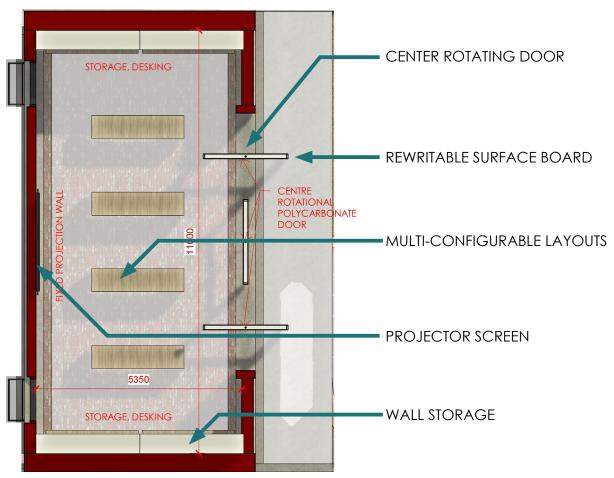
Workshop design: Floor plan rendered, (Author, 2021)
